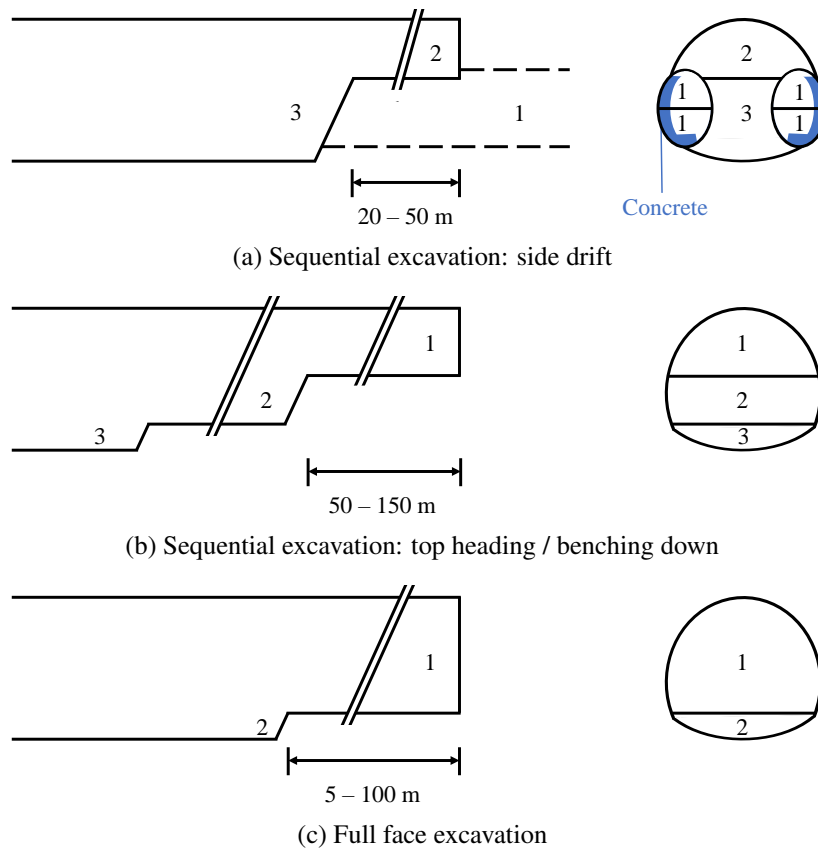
Conventional excavation methods (after Kovári and Staus, 1996)
